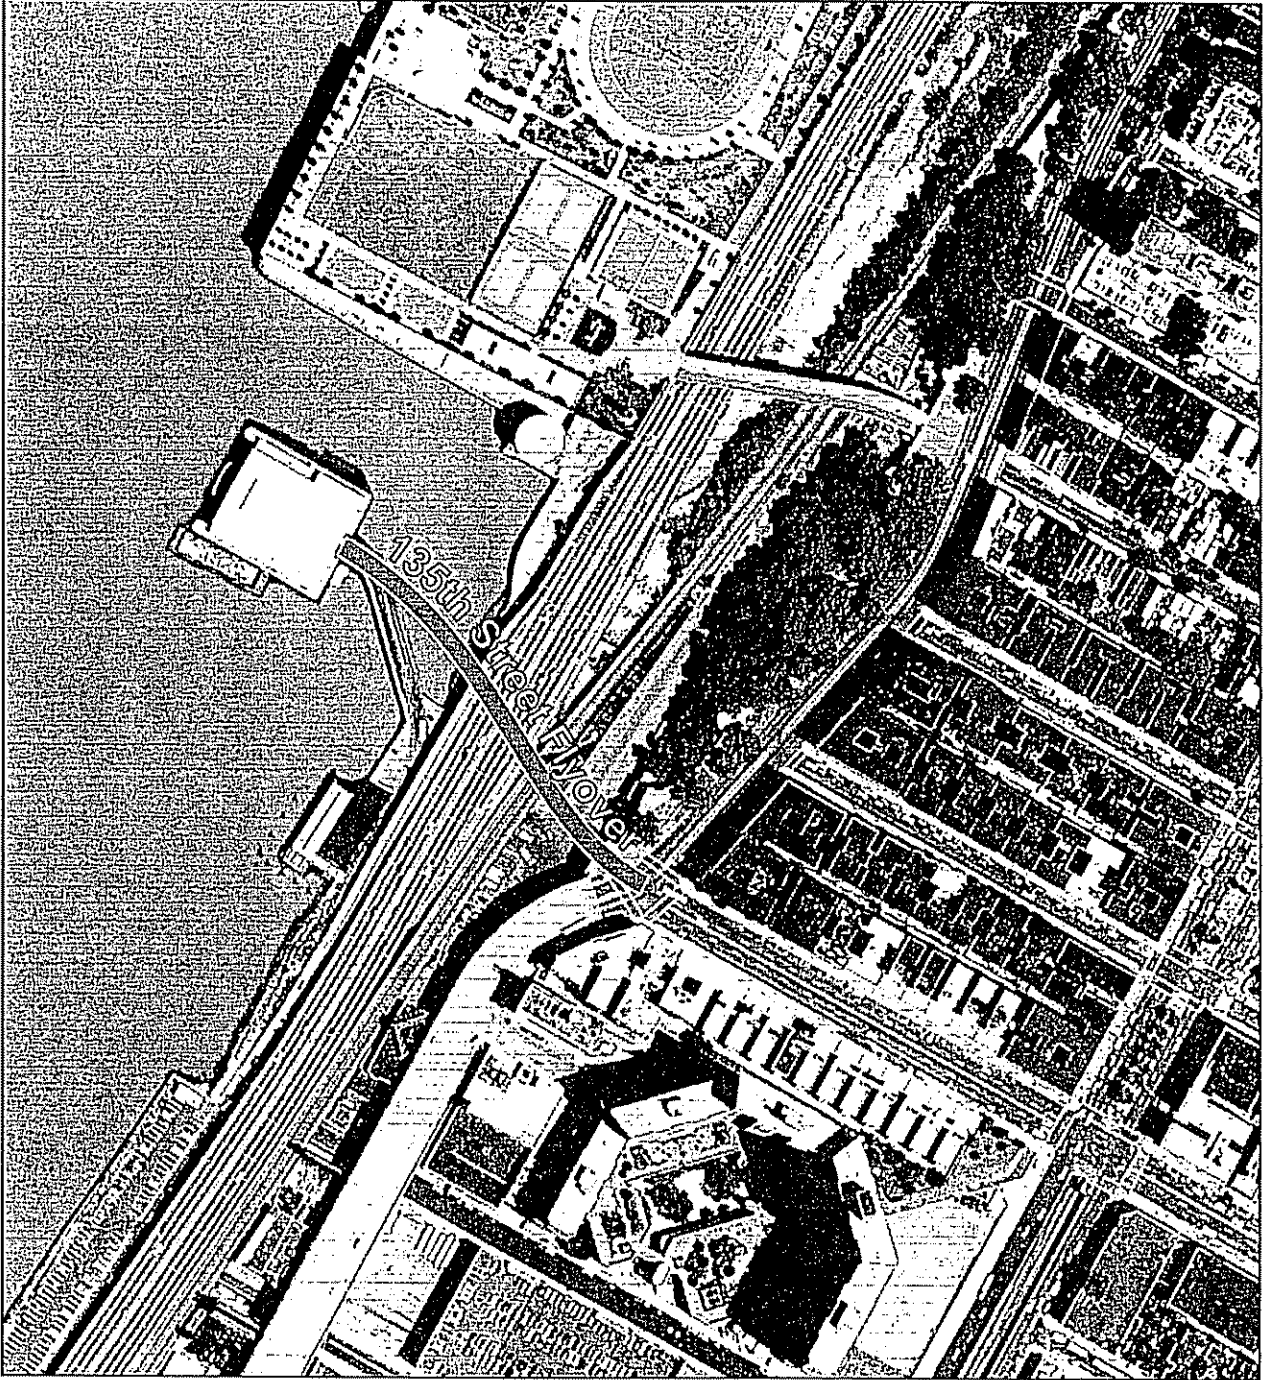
Aerial View of Proposed 135th Street Flyover Access Ramp
